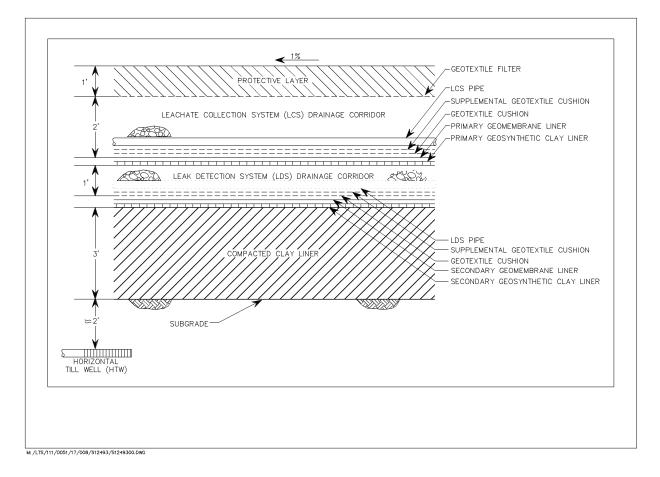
Cross Section of OSDF Liner System with HTW at the Drainage Corridor
